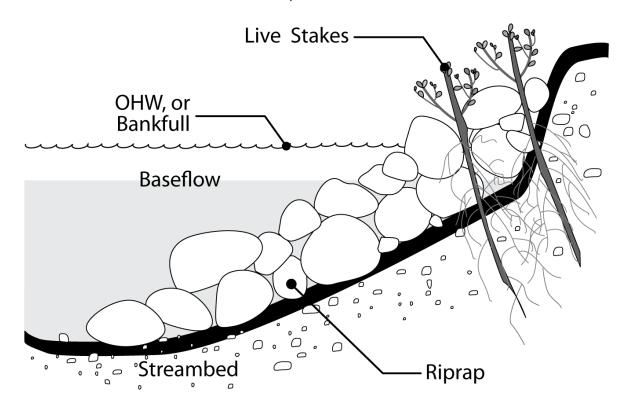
Joint Planting / Vegetated Riprap (Adapted with permission from Eubanks & Meadows, 2002).
